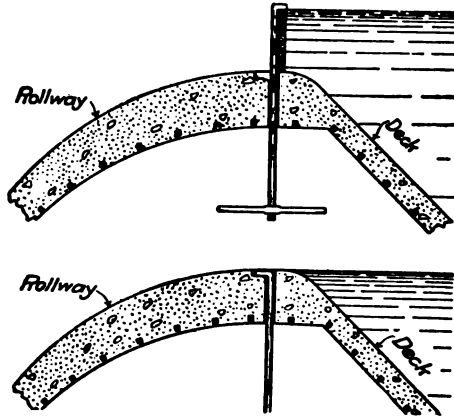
Scheme for Flashboards on Reinforced Concrete Dams.
